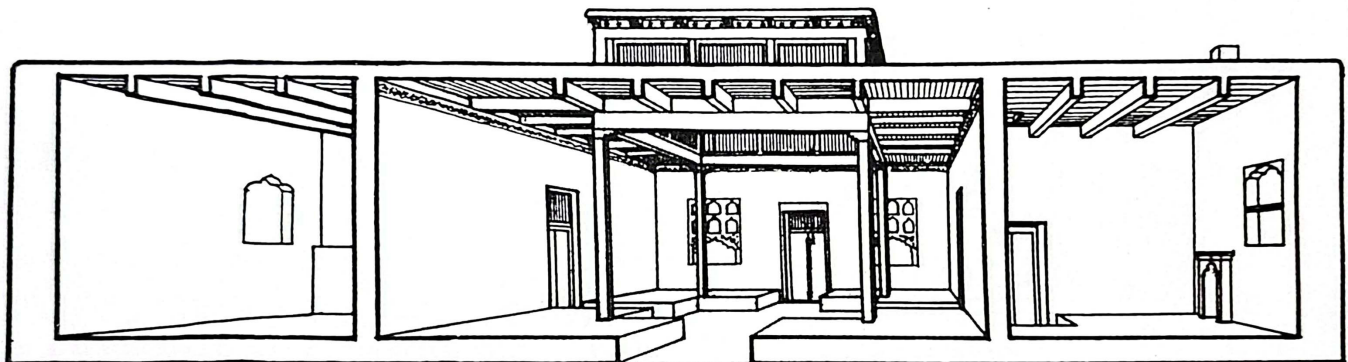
(top) Layout plan of a typical “aywan” style house.²⁰
